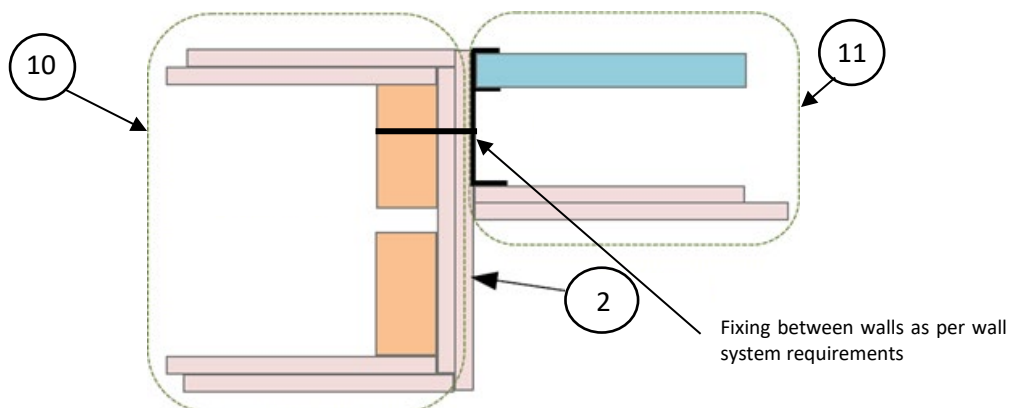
Steel stud shaft wall parallel interface with double stud timber partition – Plan view
